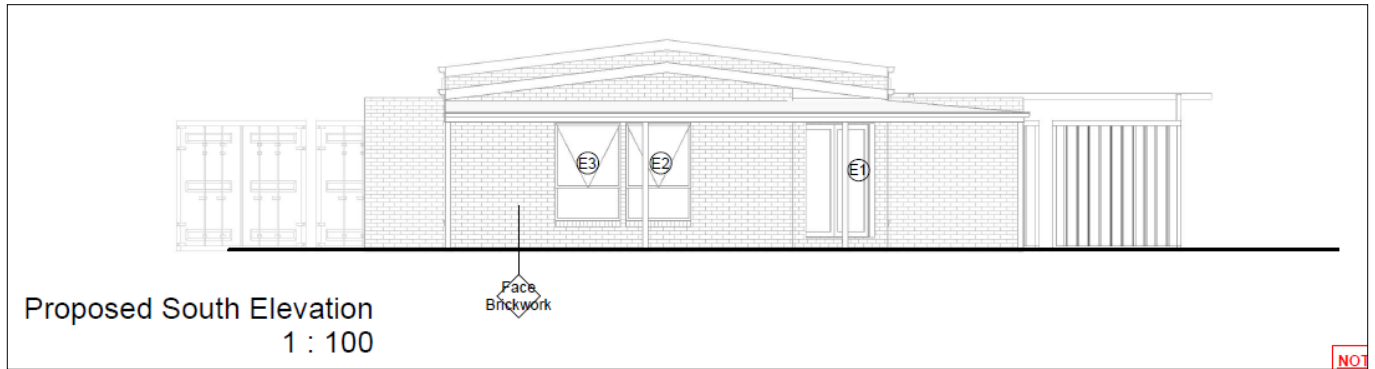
Proposed south elevation, as viewed from Mt Buller Road
